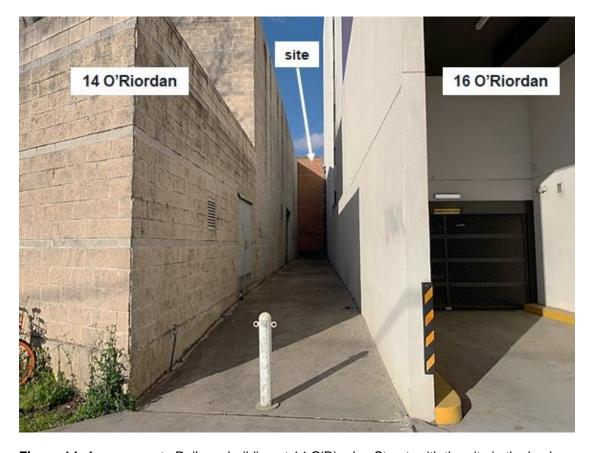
Access way to Railcorp building at 14 O'Riordan Street, with the site in the background.
